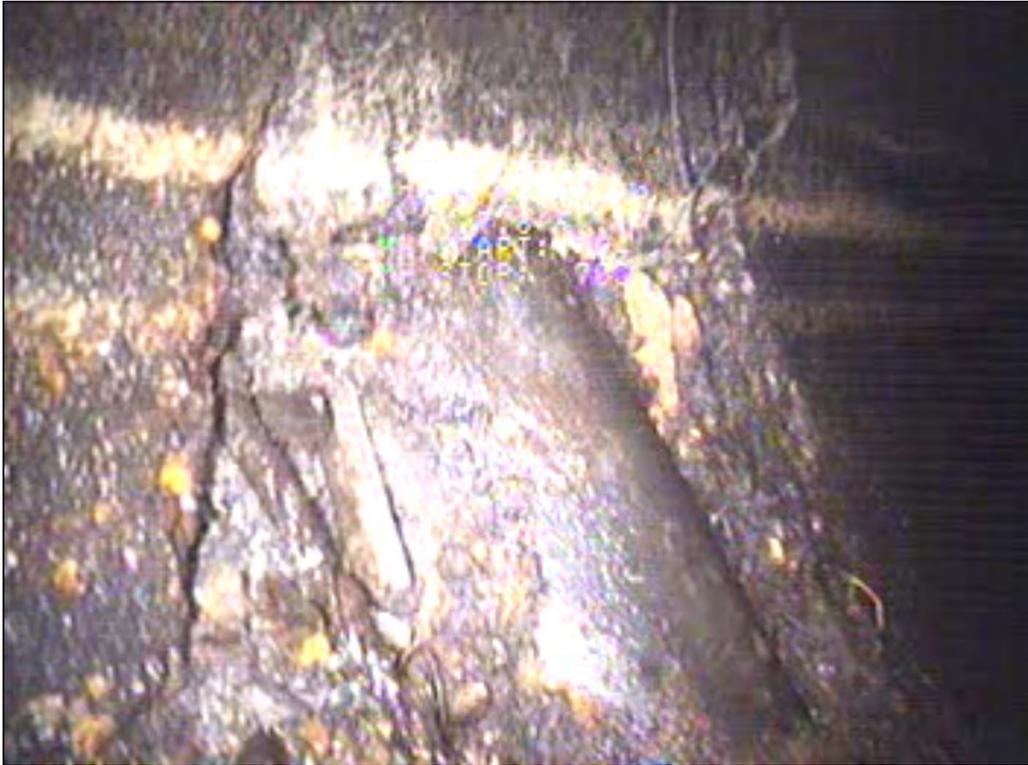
Area D: Sanitary Pipe Conflict (Culvert #803A - #803)
